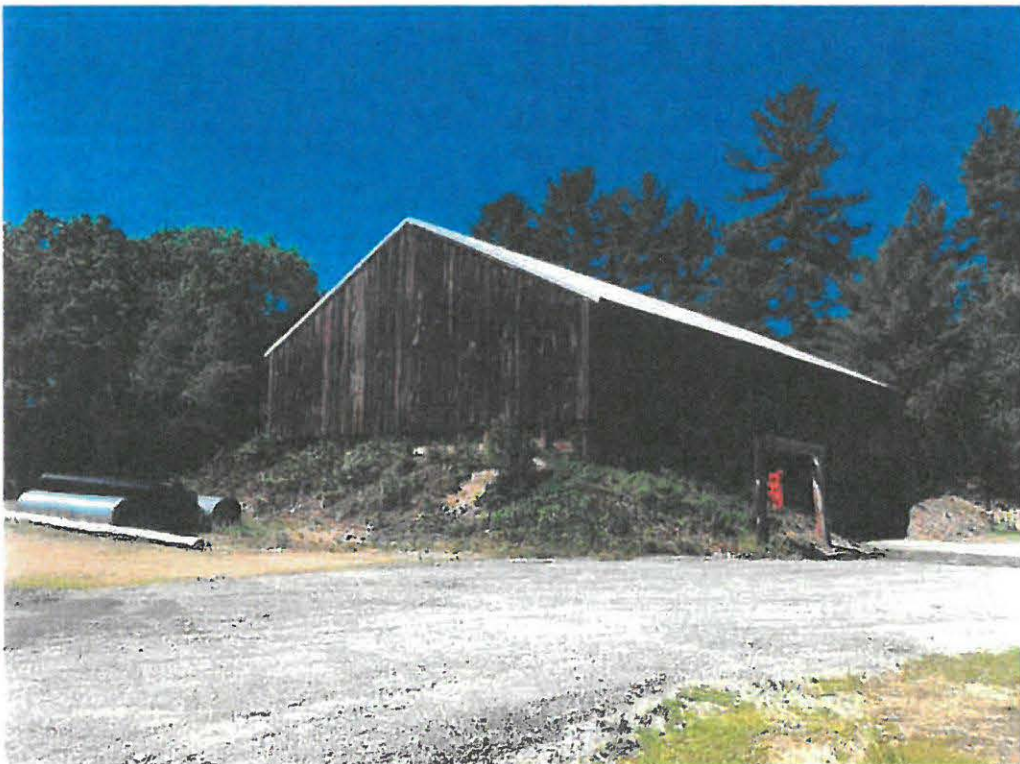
Loudon 316 – Sand fill used to hold push walls in place.
